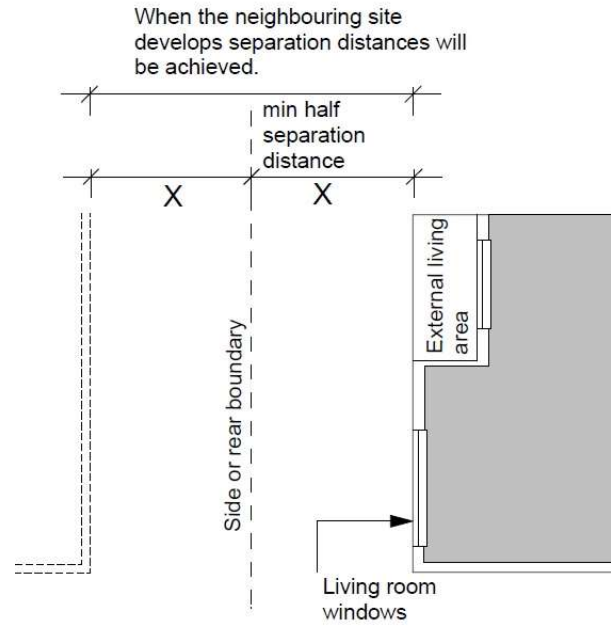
Plan - Side and rear boundary setbacks to prevent overlooking
